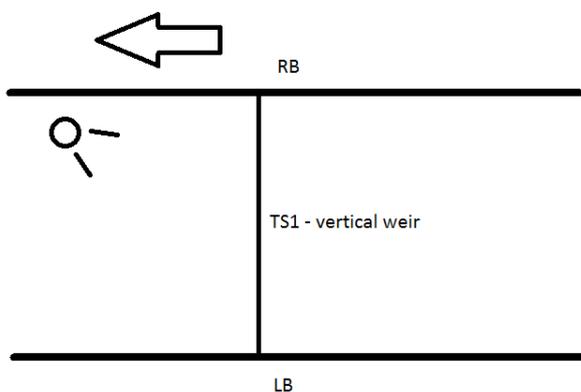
Site plan for Tidal Crane Barrier 4
